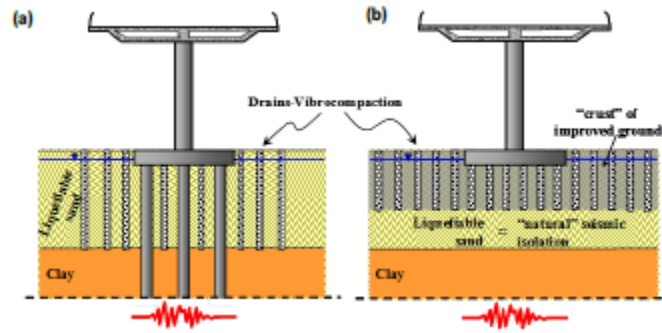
(a) Typical foundation design in liquefiable conditions involving deep soil improvement and pile construction, (b) novel foundation design involving shallow foundations with improvement of a surficial crust.
